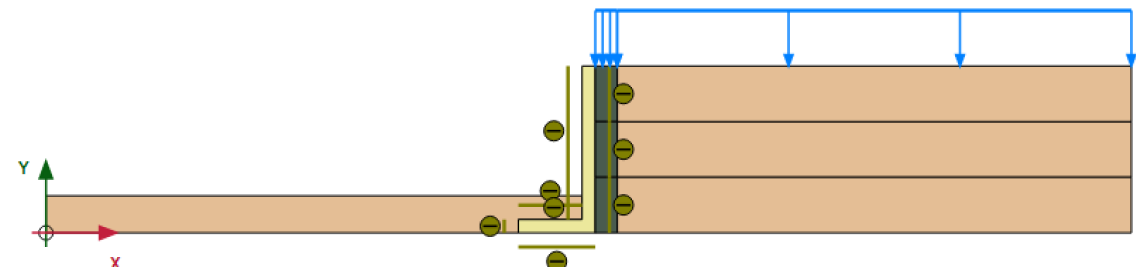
Retaining wall with no backfill slope and 0.6m width TDA backfill
